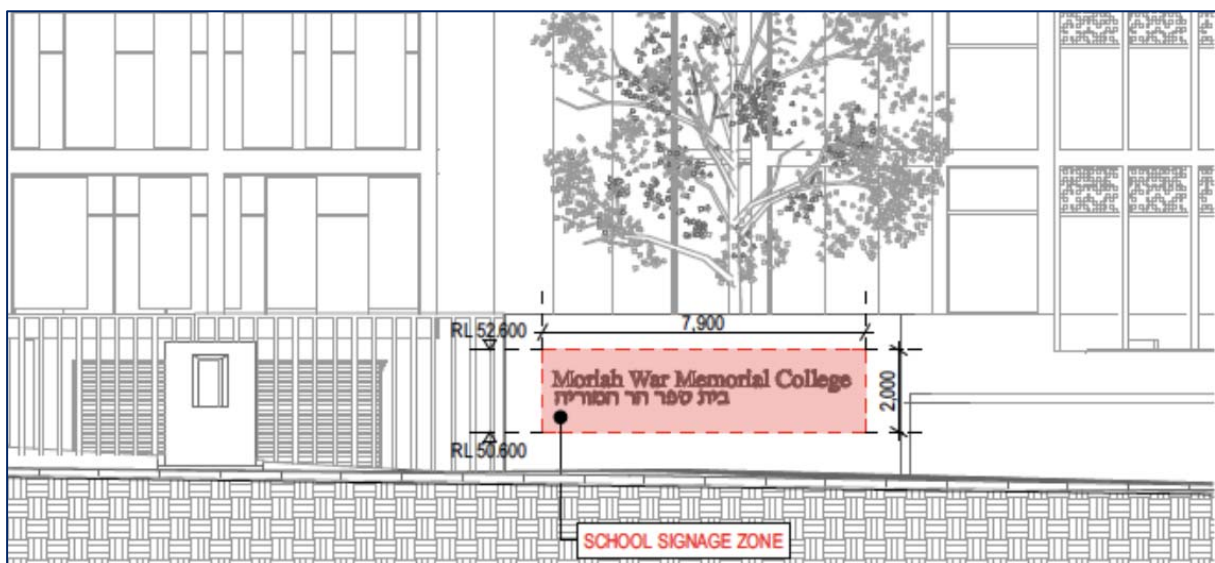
| Proposed signage zone – eastern elevation (Baronga Avenue) (Source: Applicant's SRtS)
